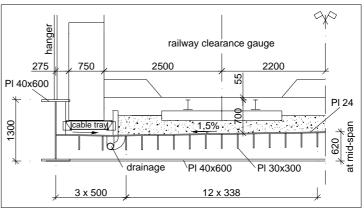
Cross section of a double track orthotropic steel deck, unit: [mm]
